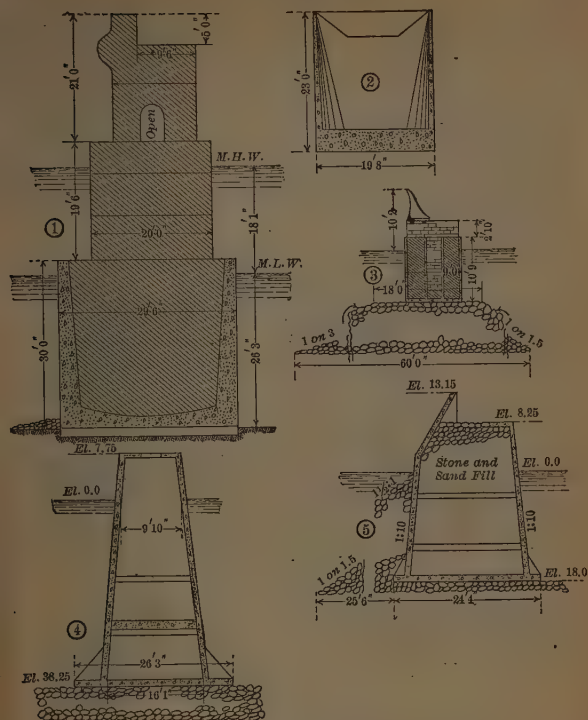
Reinforced Concrete Floating Caisson Breakwaters
